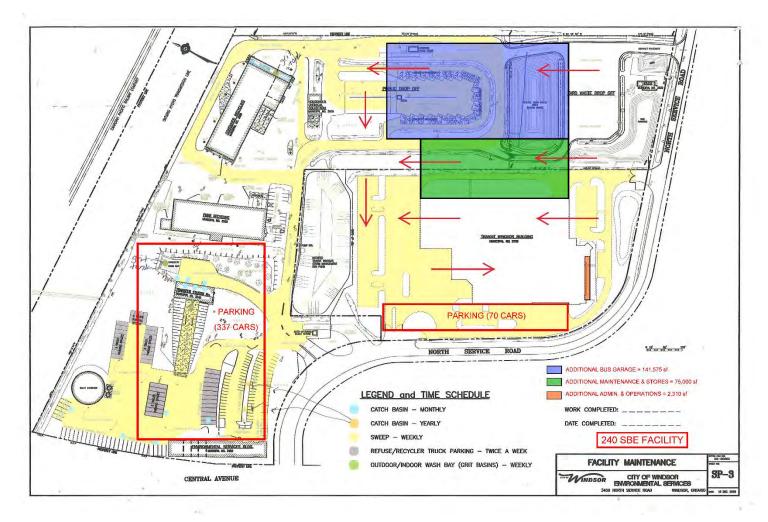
242-Bus Facility Overlaid on Existing Site
